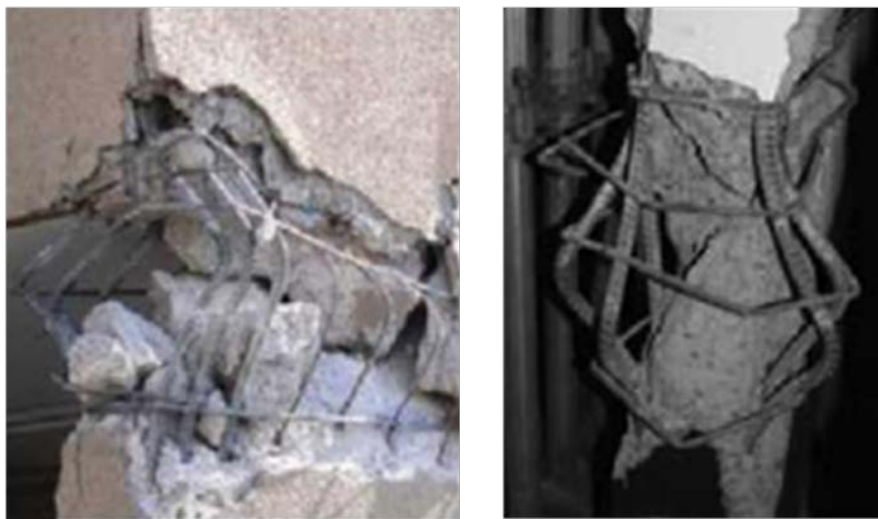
Illustrating Steel Reinforcement Buckling in Reinforced Concrete Panels Following Localized Concrete Damage [132]
